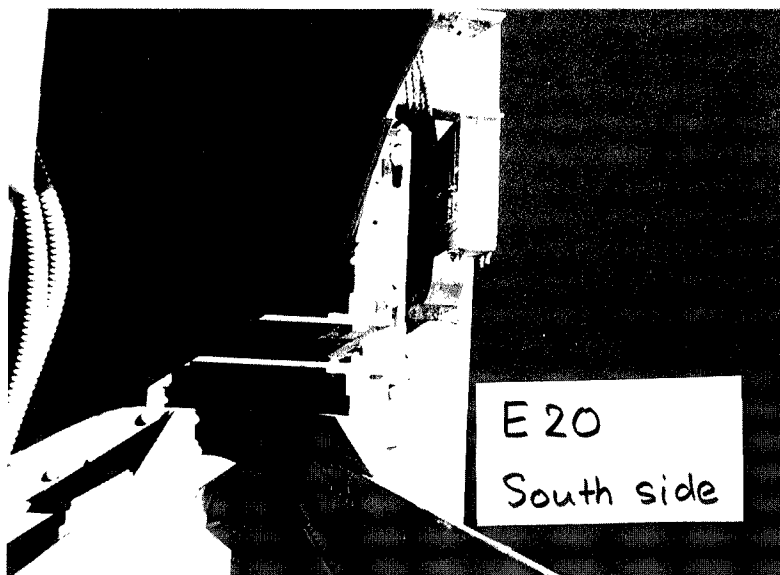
Deformed restrainer on Pier 20 of Bay Bridge (photograph by A. Astaneh).
